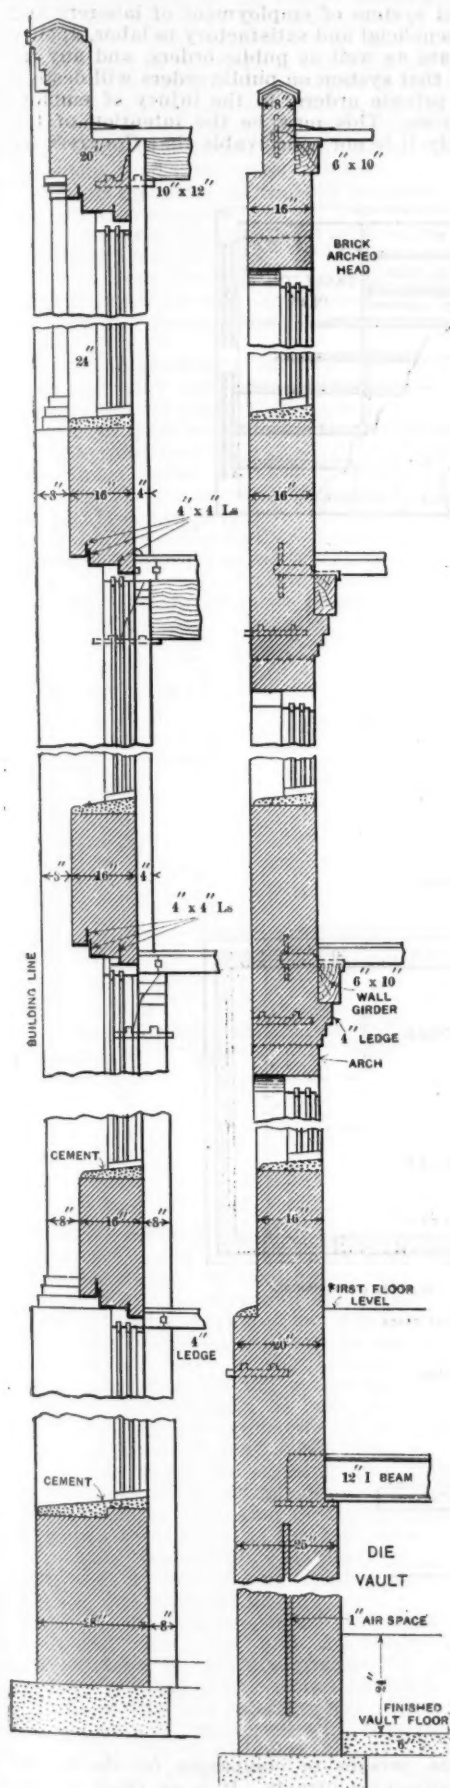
Section through Front Wall. Fig. 5. - Section through North Wall.
